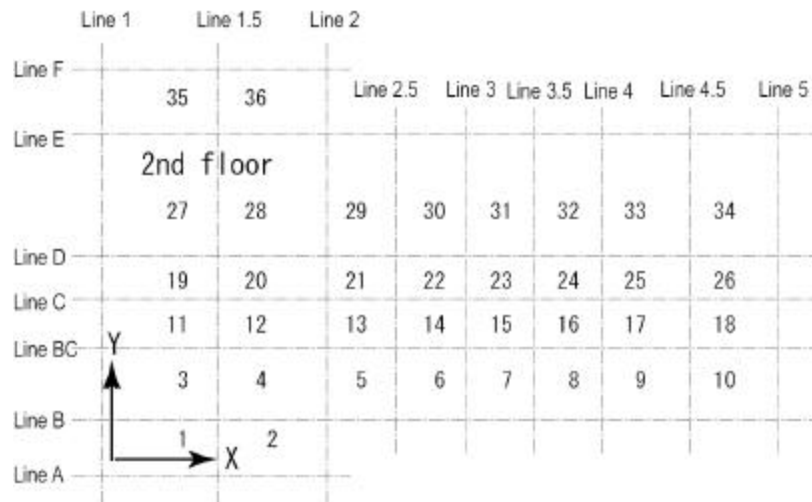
Locations, Orientation and Numbering of Quadrilateral Elements for the Second Floor of the Large-House Index Building.
